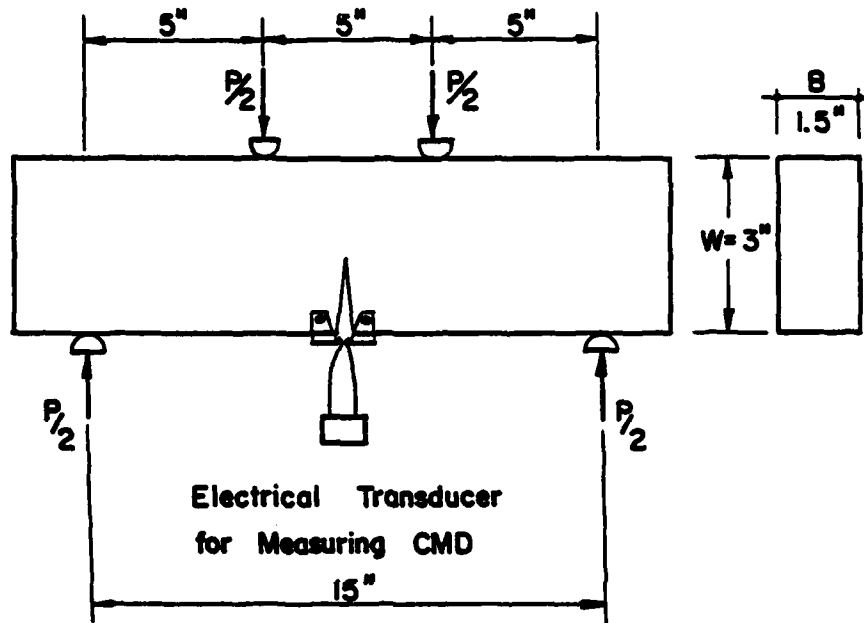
Dimensions and Test Setup; Notched Beam Specimen
